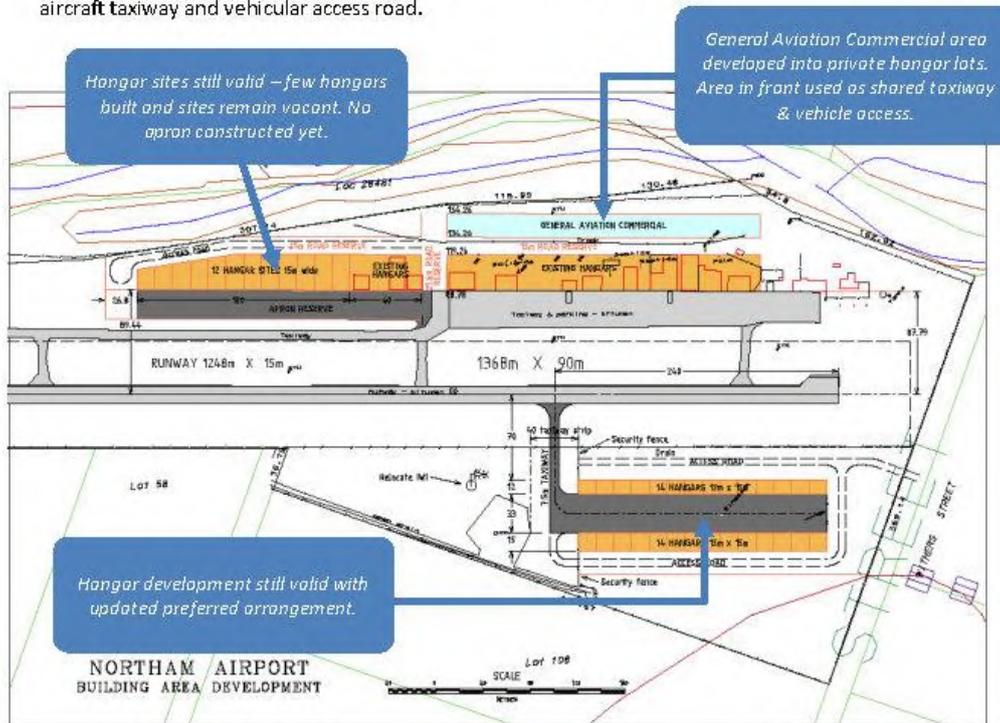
Building Area Development Plan from Northam Master Plan – June 2006
